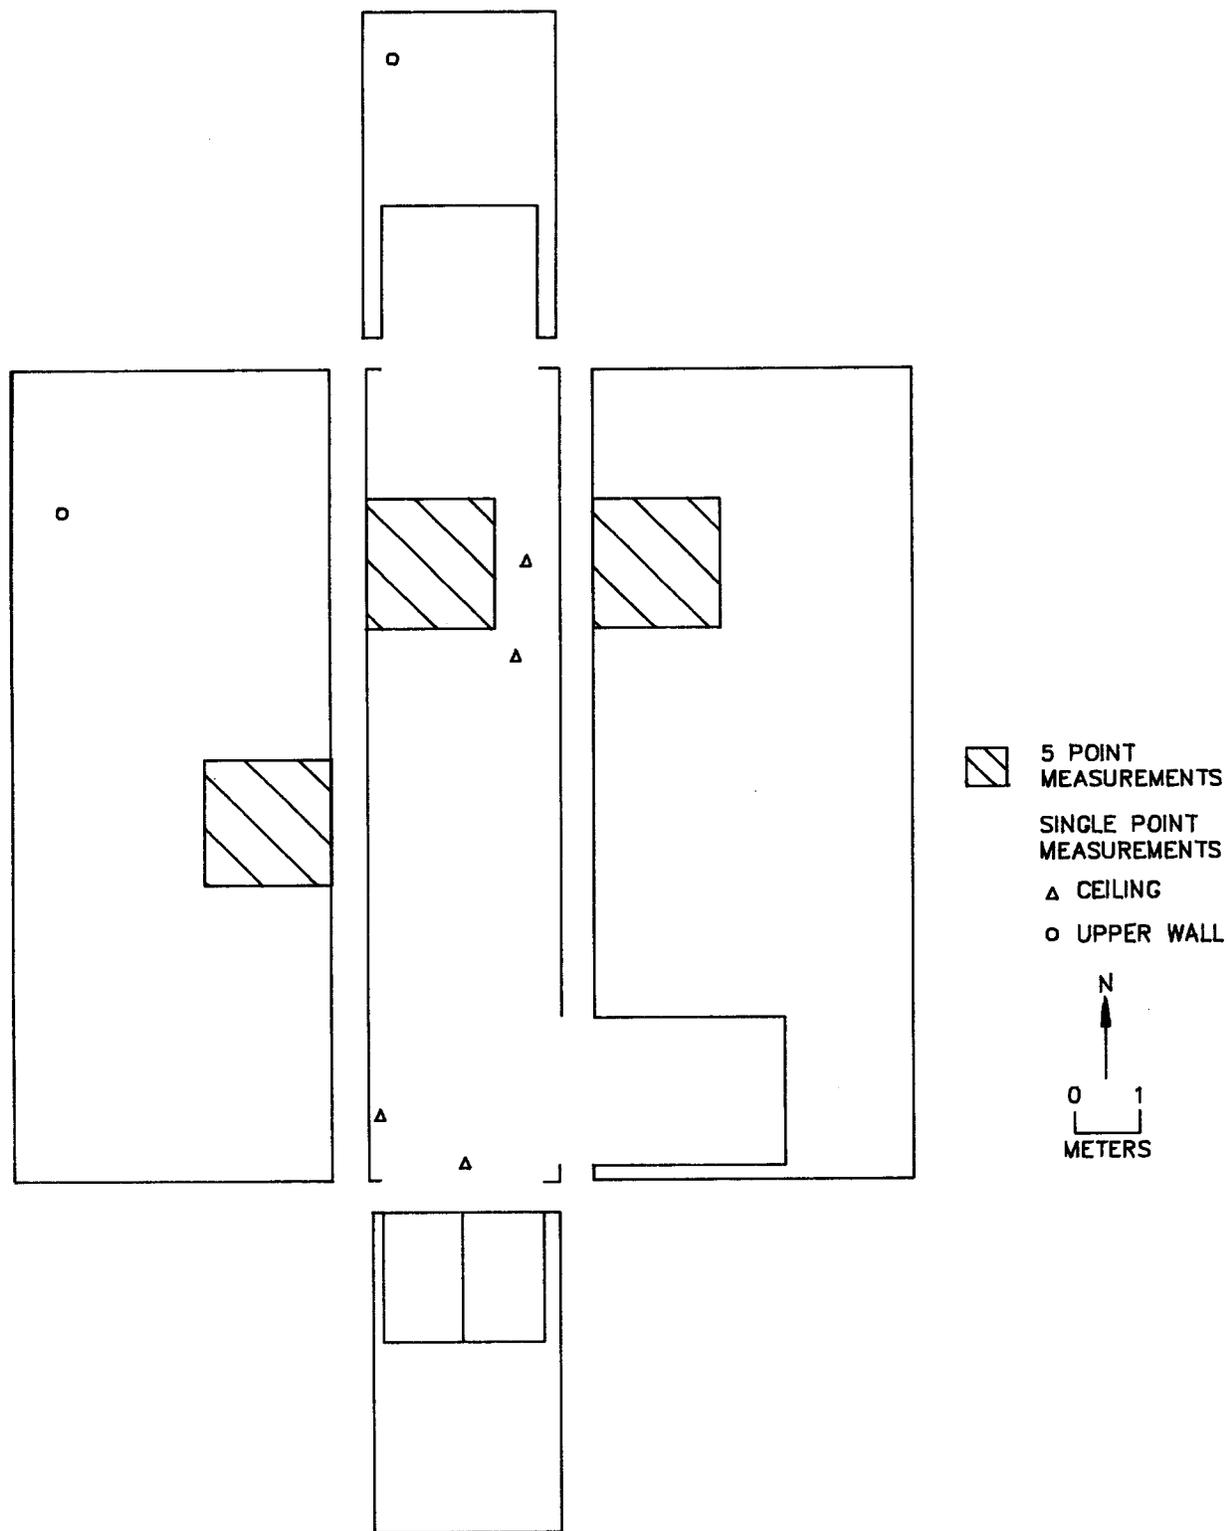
Location of Measurements in Room 130—Airlock to Controlled Area
